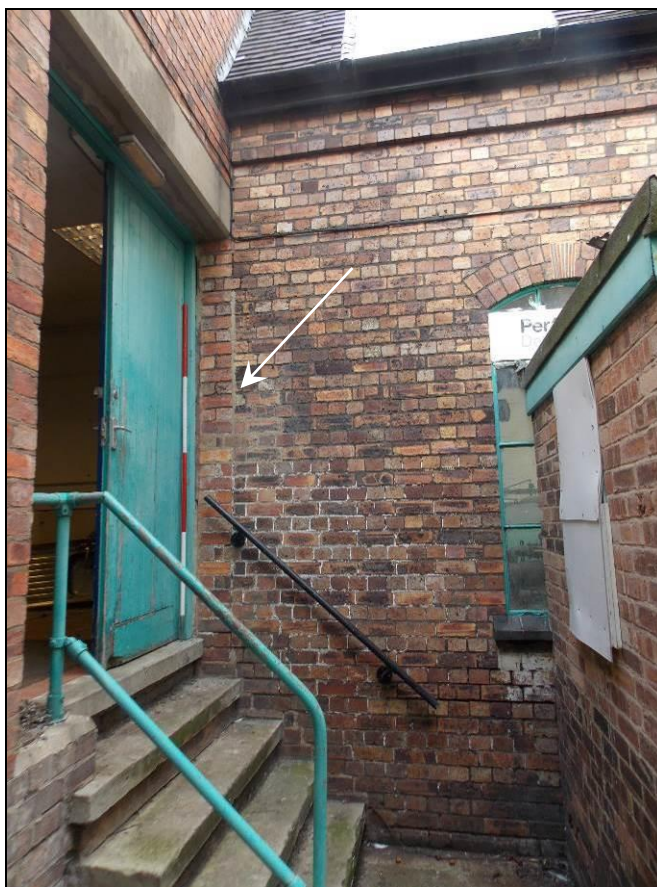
Detail of construction break (arrow), looking north (scale 2m).
